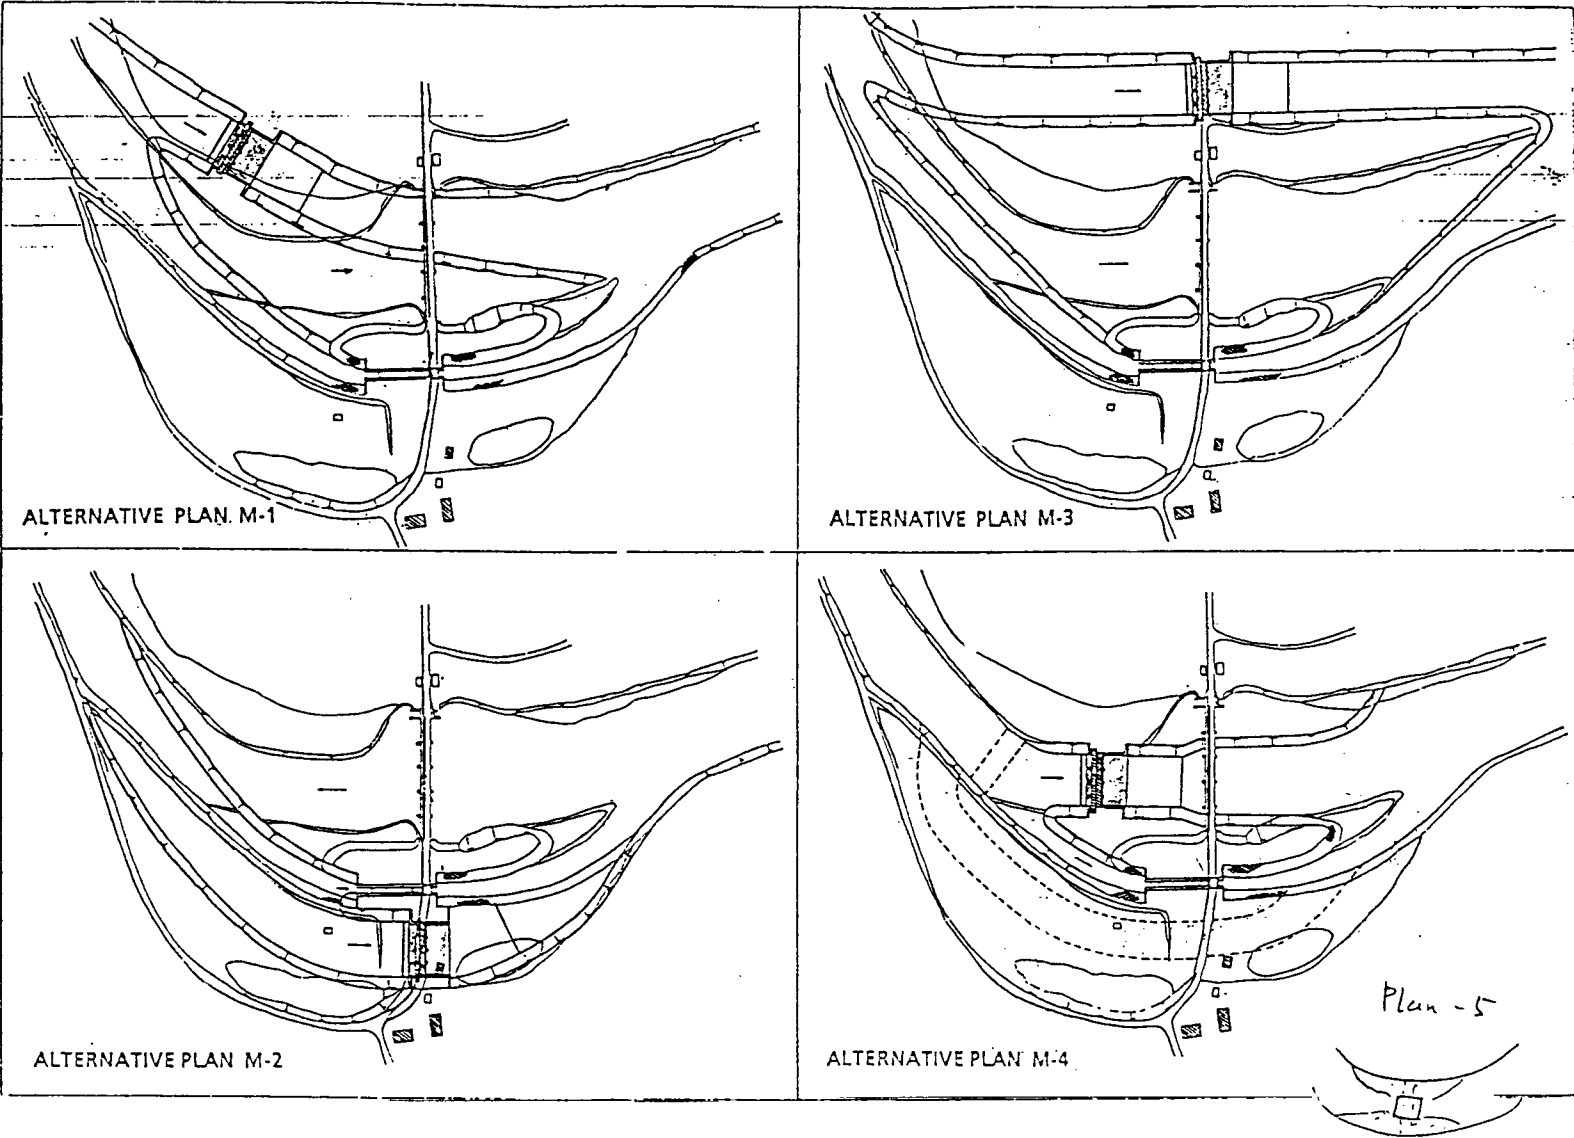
Alternative Plan of Proposed Site (Mazoura Regulator)
